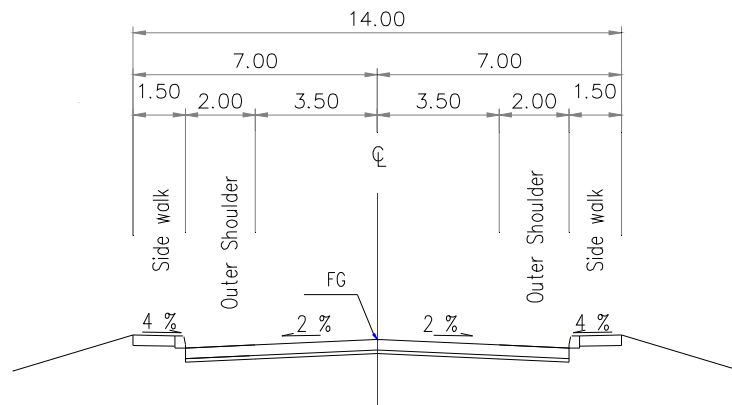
Typical cross section of Access Road for Phase 1 of North Kalibaru
